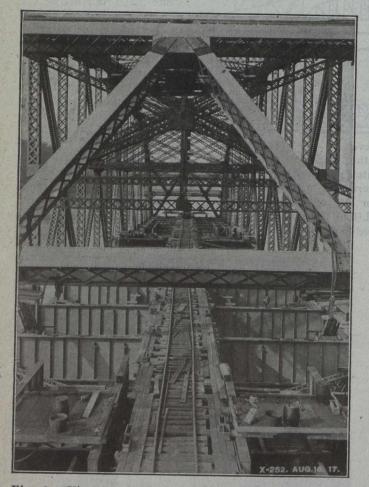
View Through New Suspended Span, Showing Sway Bracing
